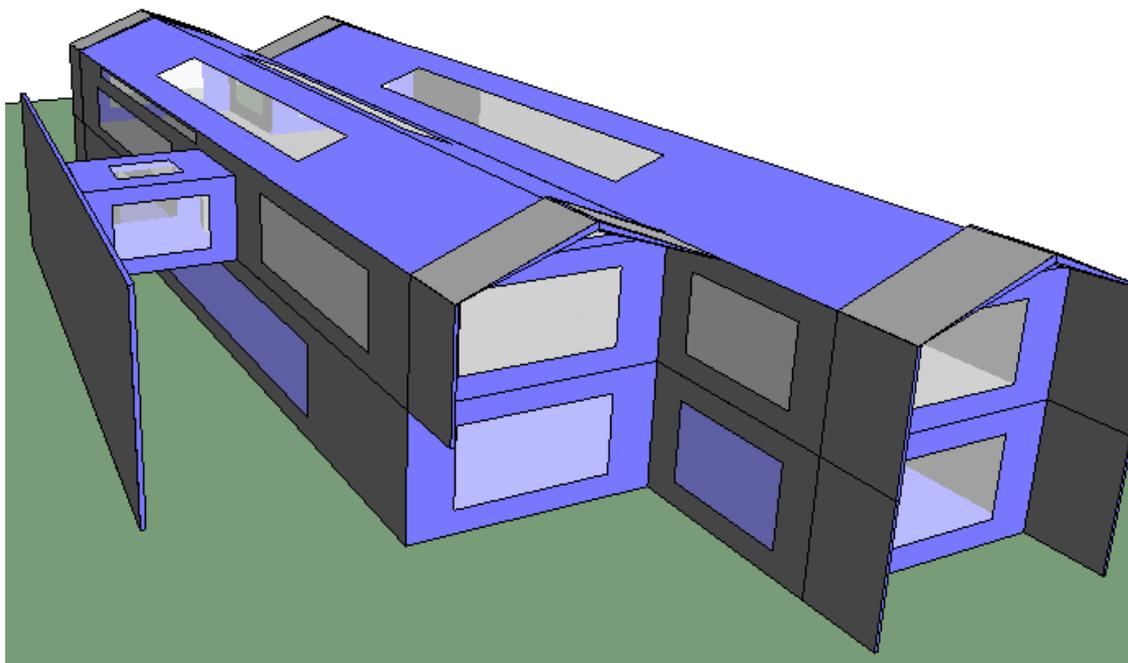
Building Envelope with Glazing 20%, Roof Areas and Roof Lights 40% of Total Façade Areas
